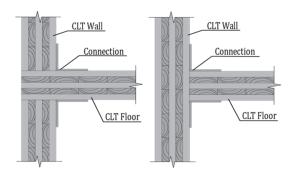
Left: CLT platform construction. Right: CLT balloon construction
